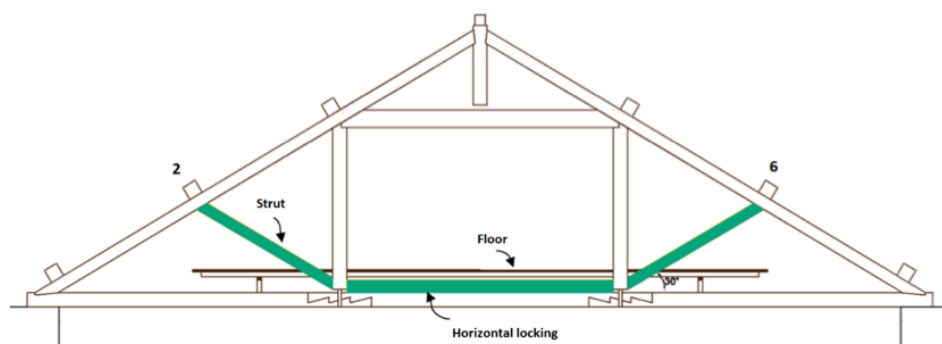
Runa Military Asylum Palladian truss - Strengthening Proposal.
